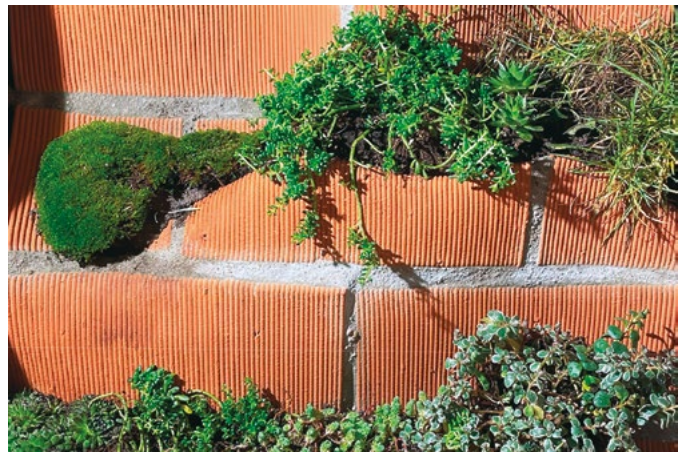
Greened façade hosting undemanding plants. Note the vertical layer artifacts in the bricks.
